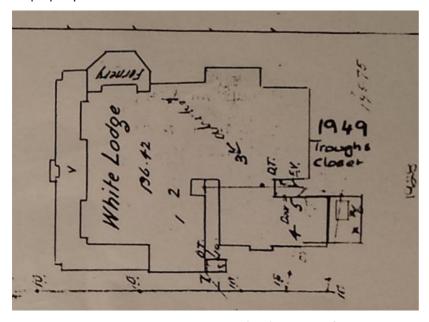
The 1903 Property Sewerage Plan (PSP) showed a floor plan that matched that shown on the 1902 MMBW plan (with later annotations).
